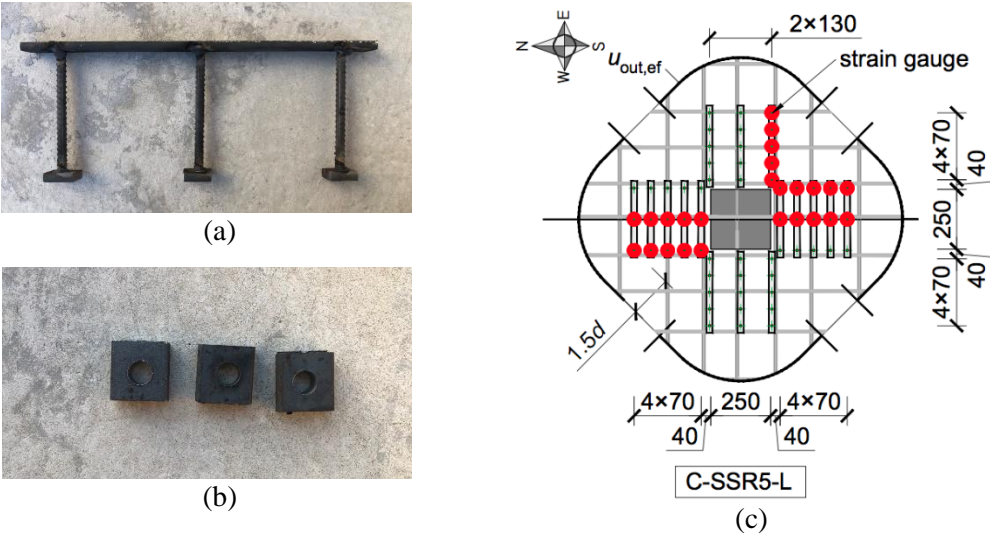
Headed Studs shear reinforcement details and positioning: a) a stud rail; b) bottom heads; c) layout.
